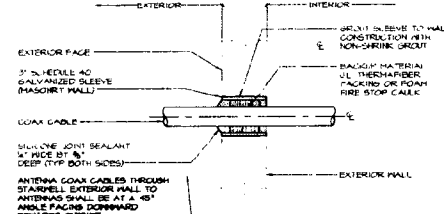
DETAIL - COAX ROUTING THROUGH STAIRWELLS
